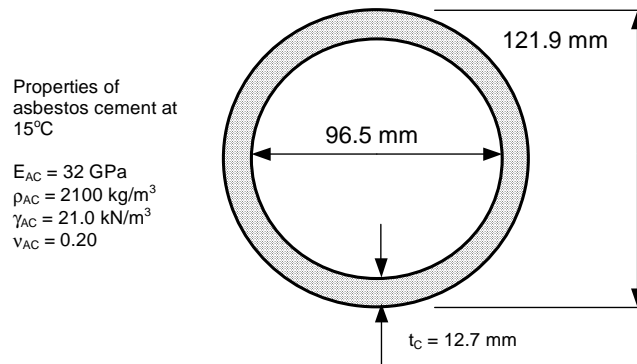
Cross section and details of the Saint Johns Terrace Pipeline
